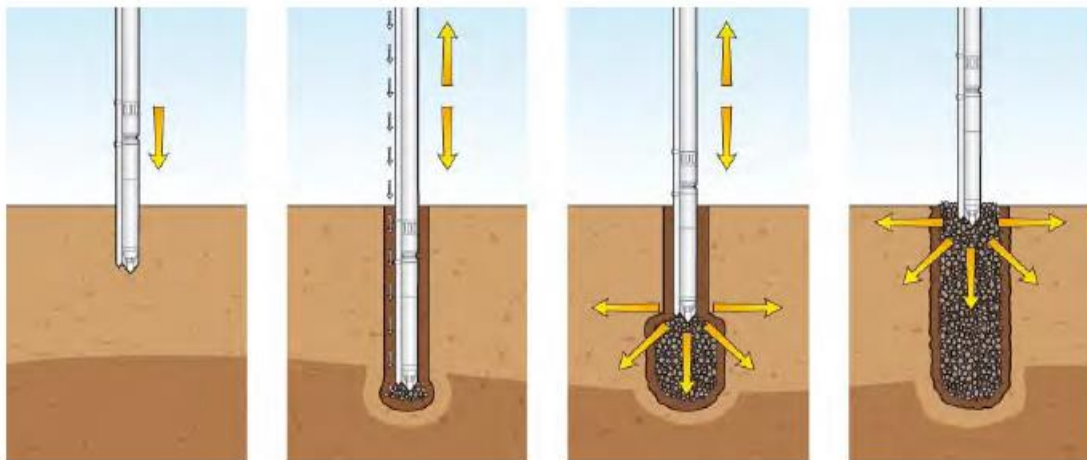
Stone column construction. Dry-bottom feed technique. (Taube,2001)
